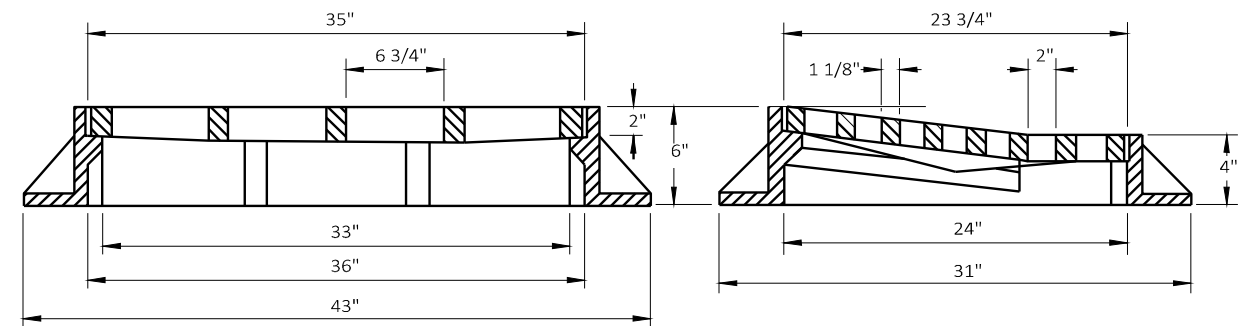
DETAIL FOR COMPUTING MANHOLE STRUCTURE ELEVATIONS
